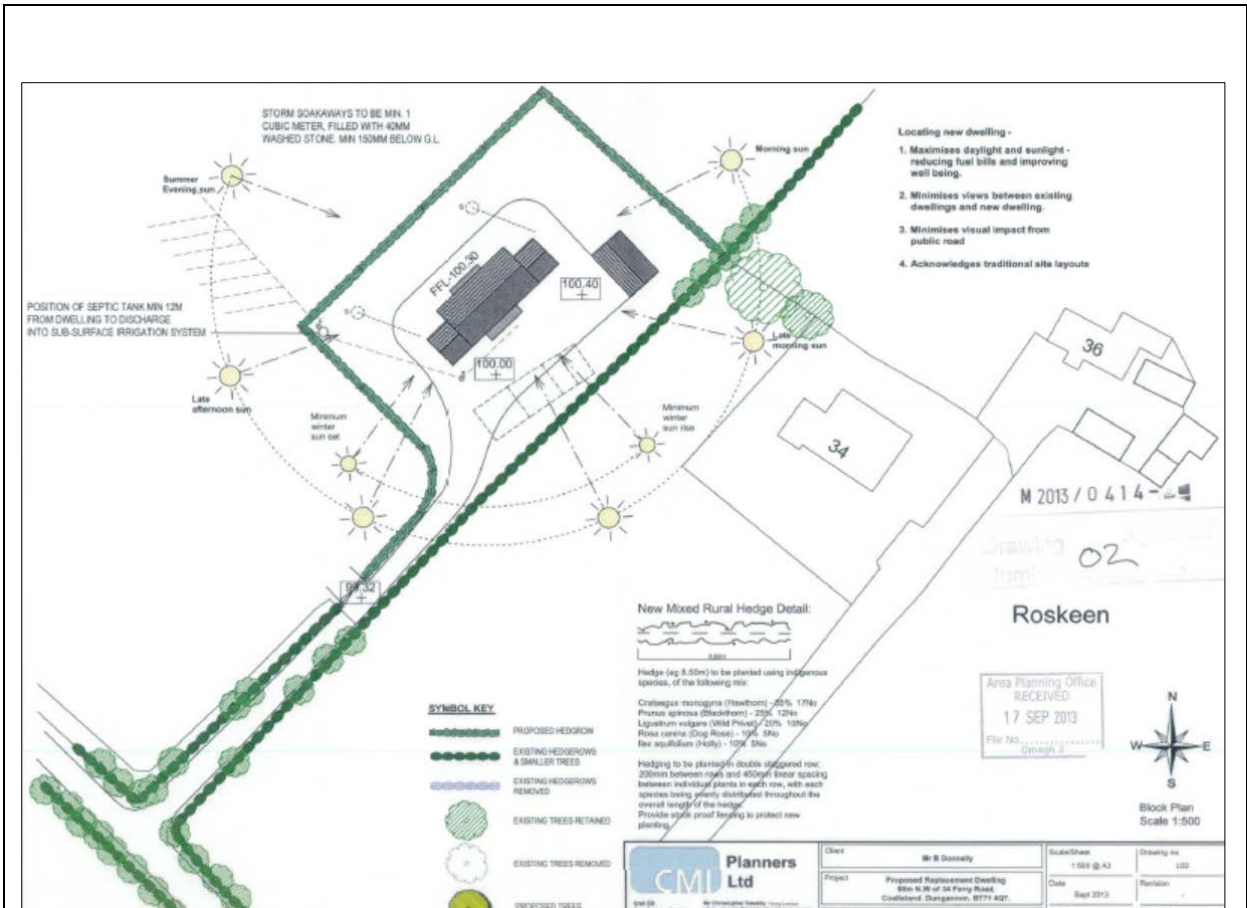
Block plan of dwelling and garage approved under M/2013/0414/F
